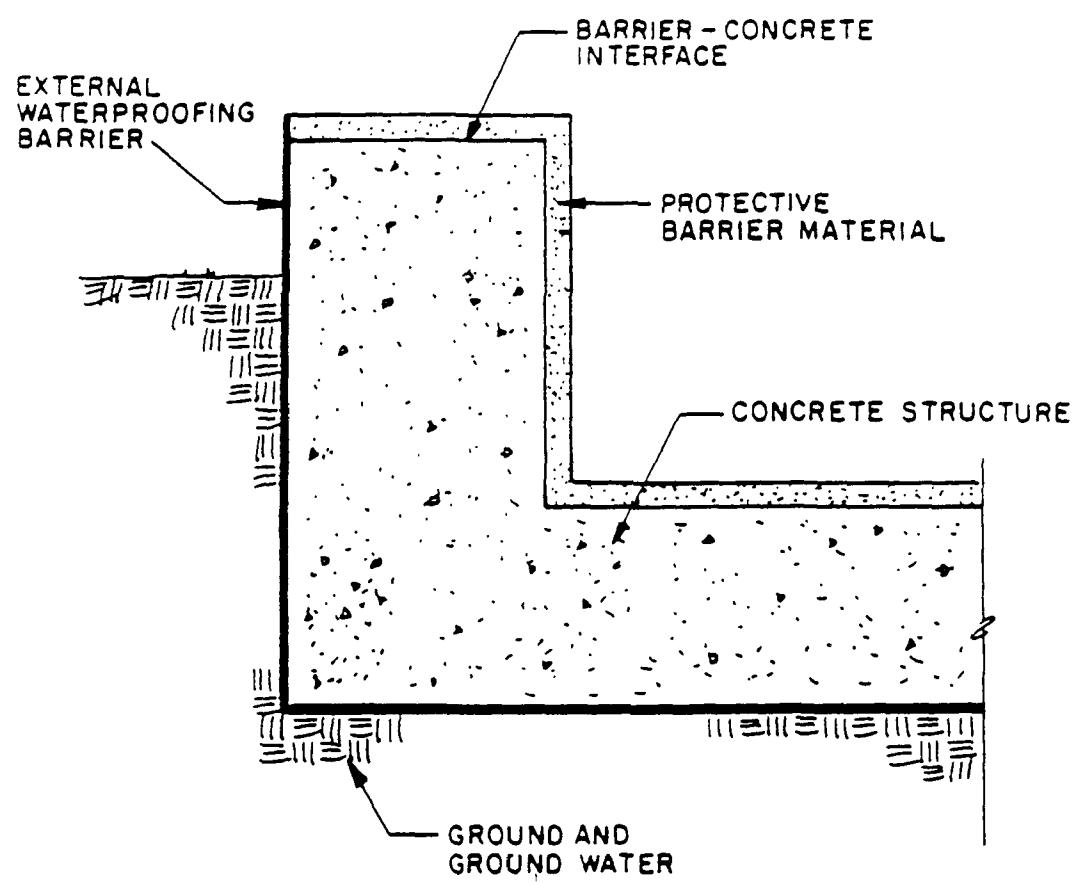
Typical Application of External Waterproofing and Internal Protective Barrier Systems to Concrete Sumps
